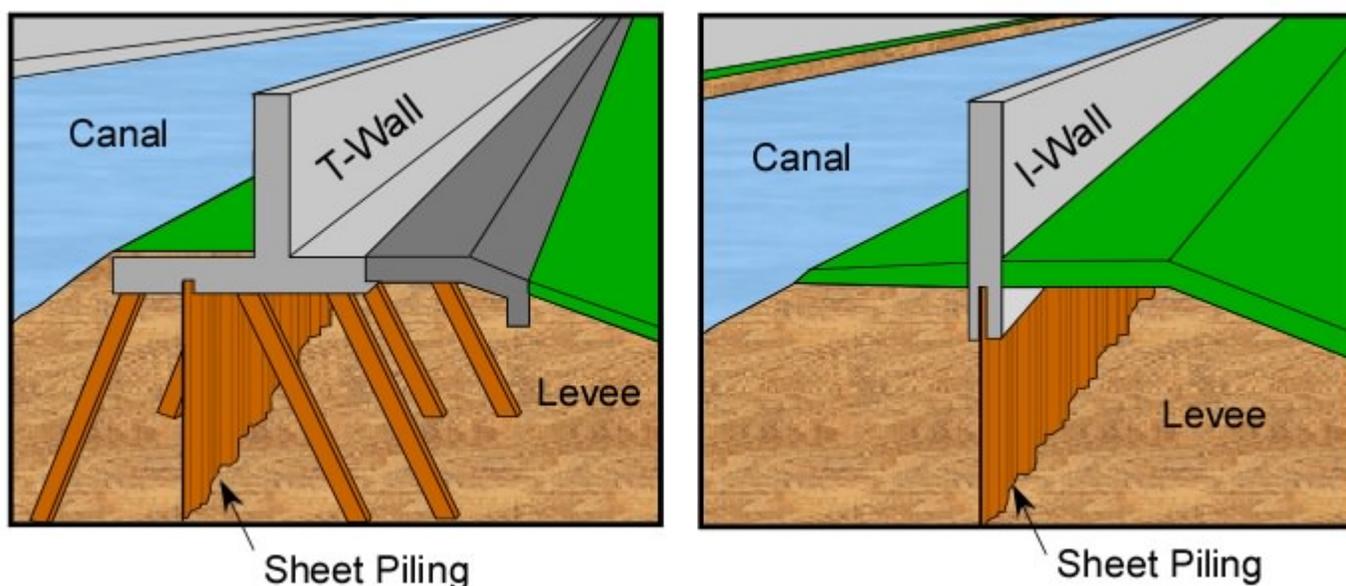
Most pre-Katrina floodwalls in New Orleans were built with the I-wall design (right). In repairing failed floodwall sections after Katrina, the T-wall design (left) was used.
